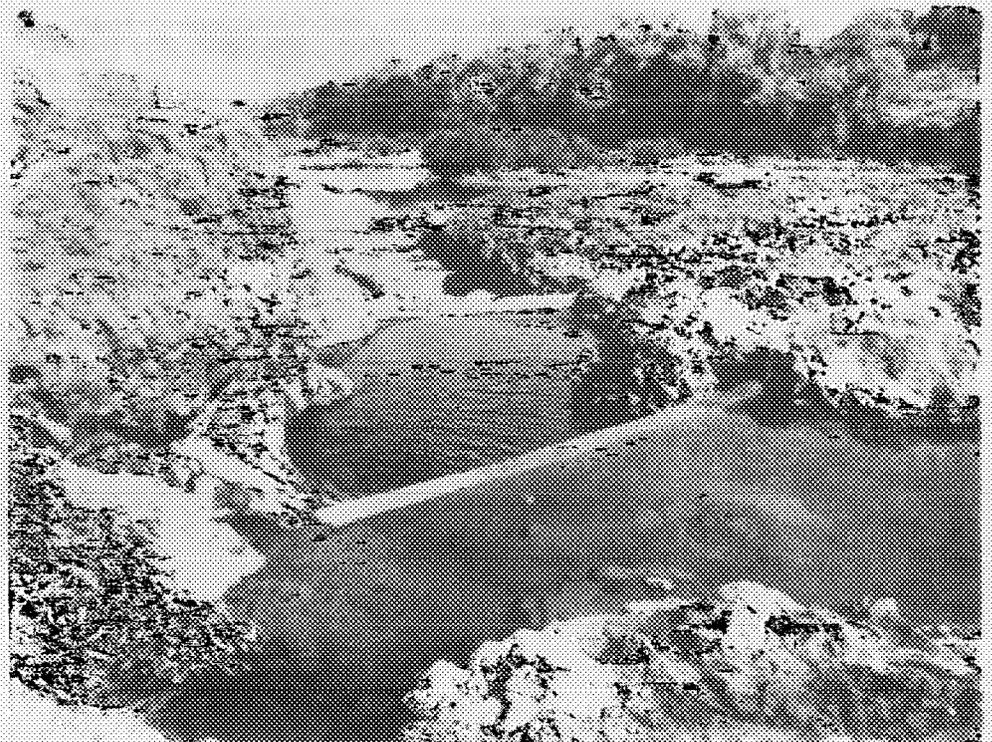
DOWNSTREAM VIEW OF WEIRS 7 AND 6
